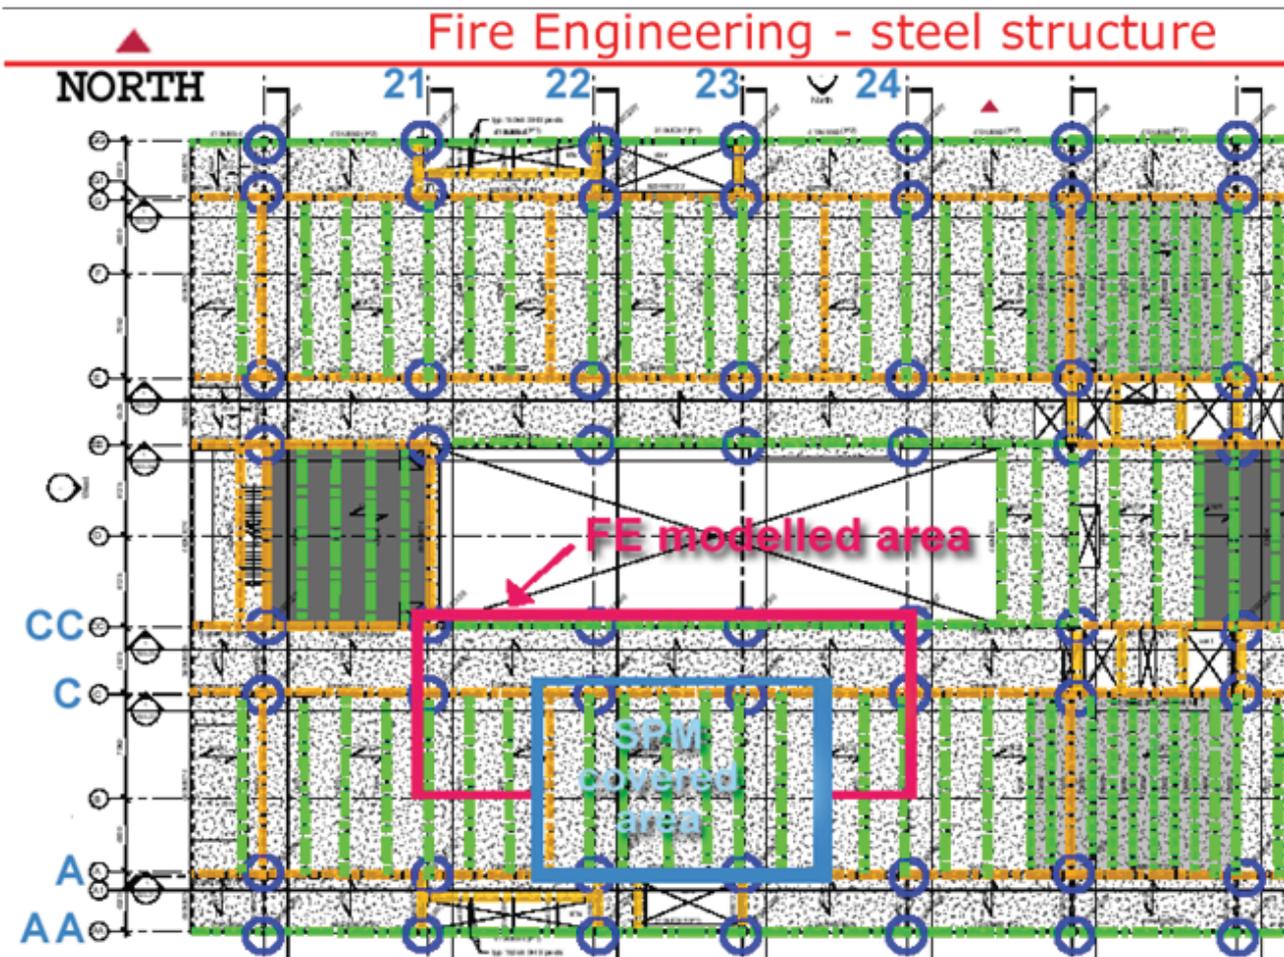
Typical floor showing the fire engineering design and part of the building modelled in the finite element analyses
